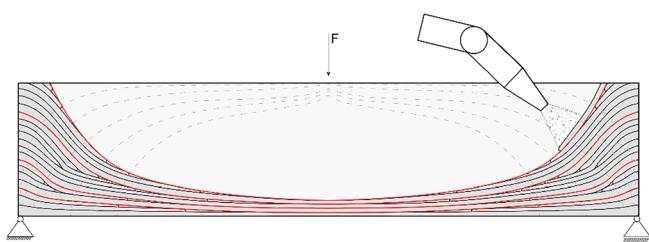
Exemplary path planning strategy for the force flow controlled combined additive manufacturing of a single-span beam consisting of prerunning supporting concrete layers (gray) and following running in place reinforcement (red). Source: Institute of Structural Design
